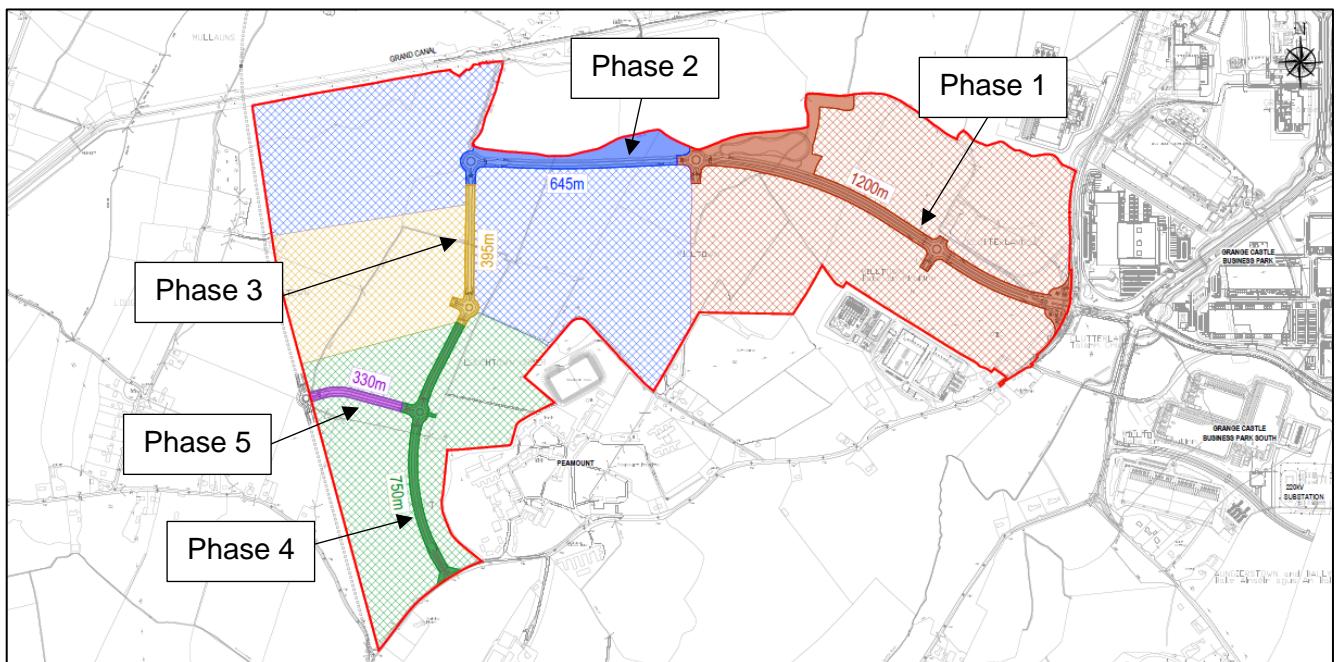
Proposed New Nangor Road Extension and Masterplan Phasing.
